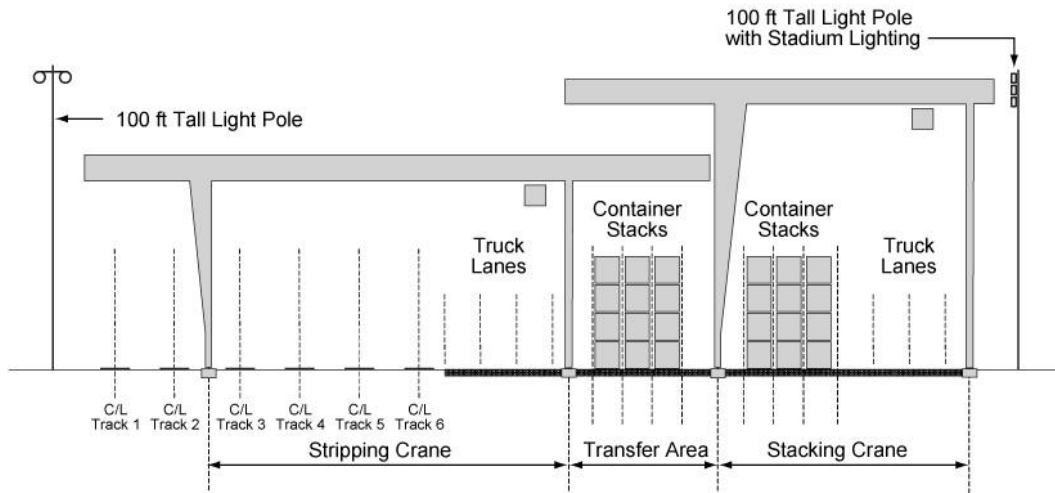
Typical intermodal rail yard cross section with stripping and stacking RMG cranes.
